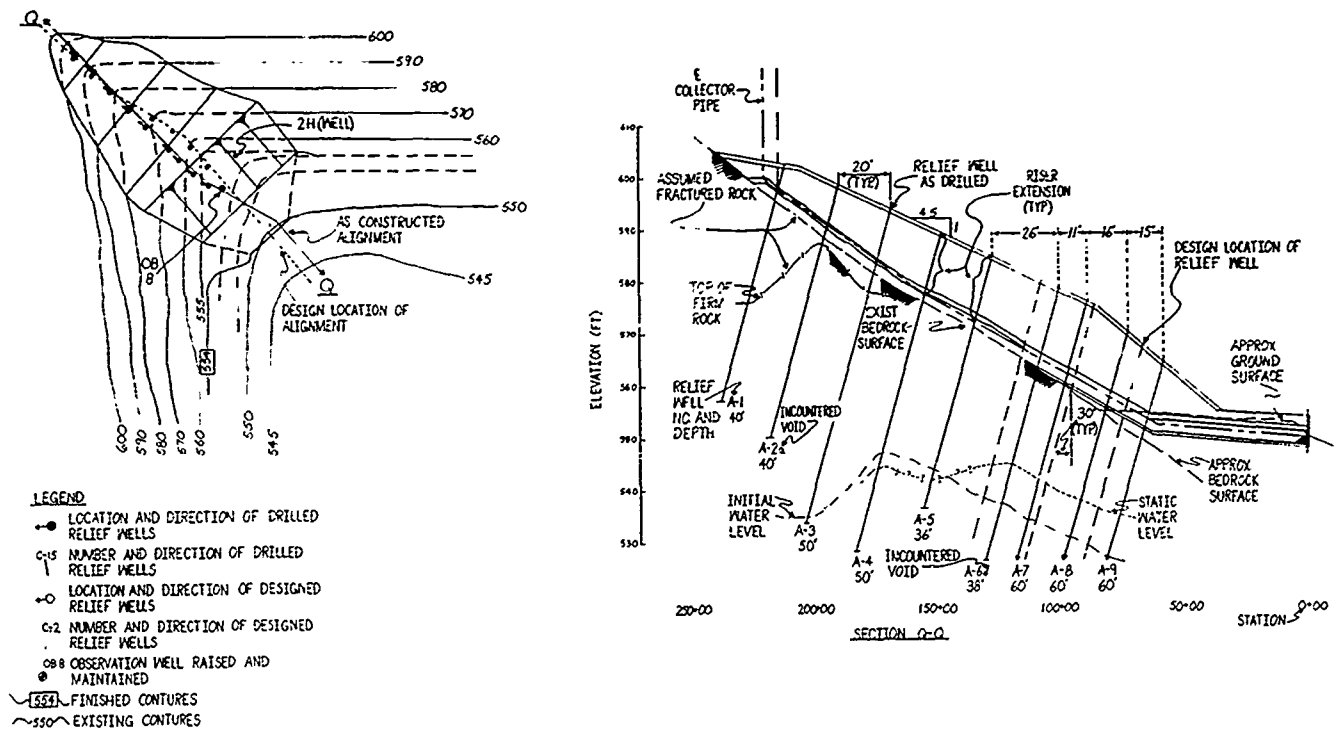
Plan and section of seepage control systems and stability berm constructed in Areas A and B.
